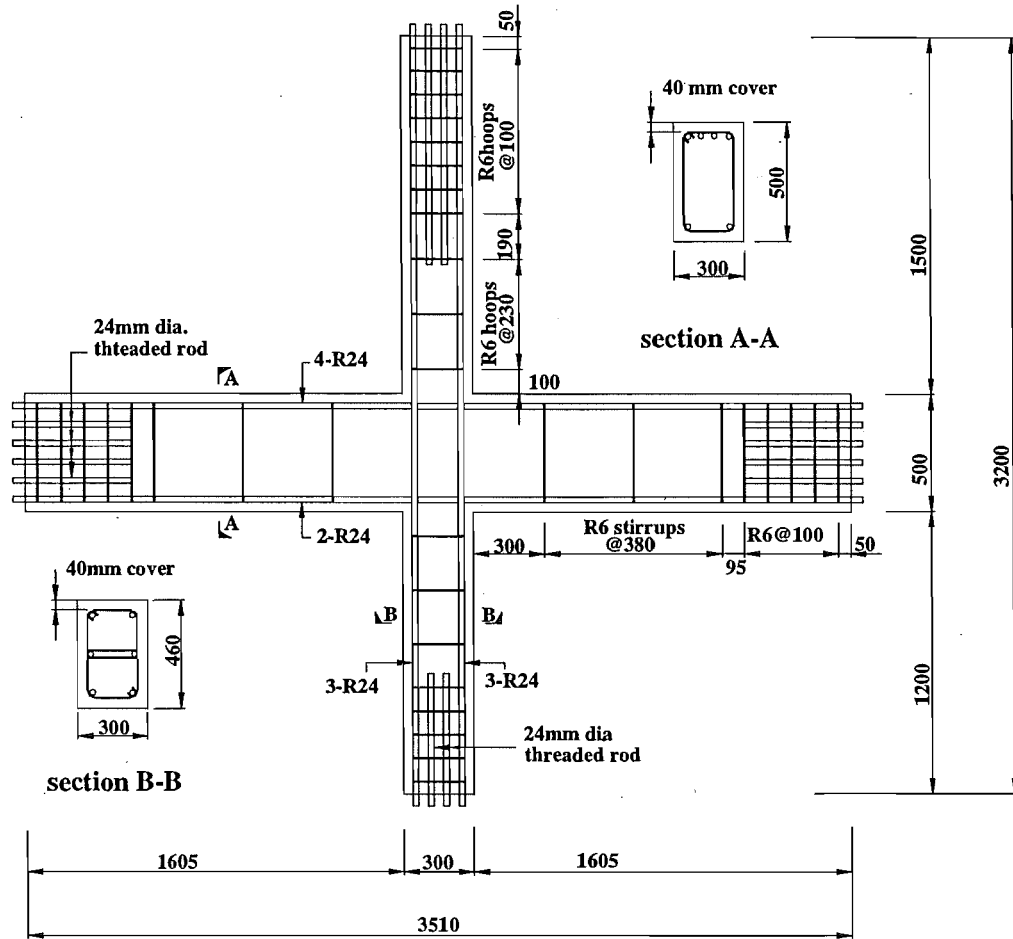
Reinforcement Details of the Two Interior Beam-Column Joint Specimens
